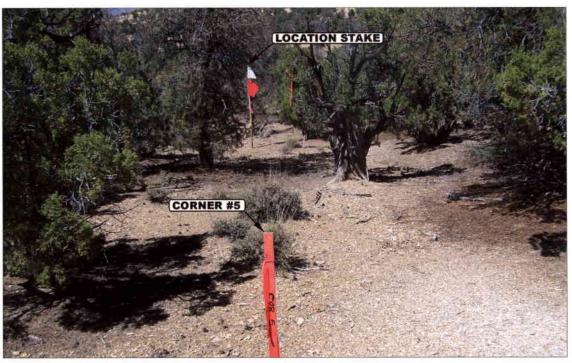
PHOTO: VIEW FROM CORNER #5 TO LOCATION STAKE
